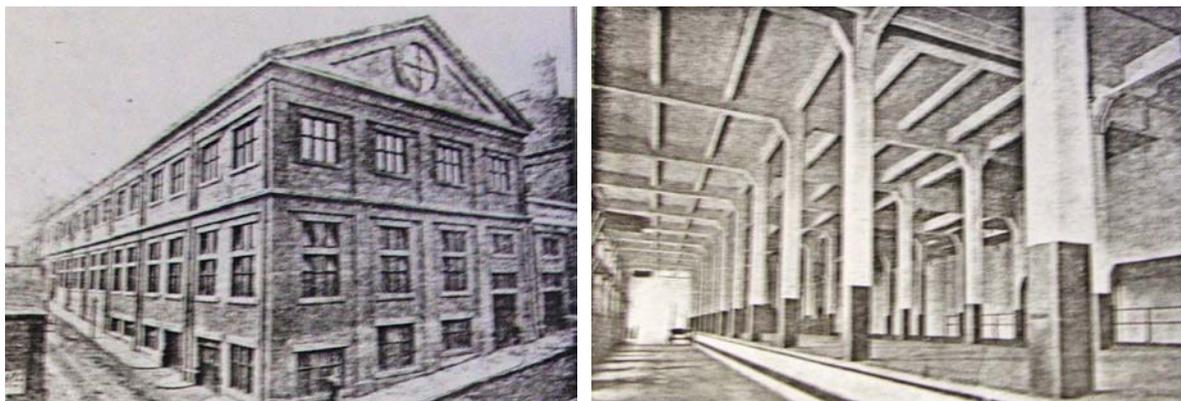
Exterior of the new warehouse at Forth Banks Goods Station, which was built in ferro-concrete
